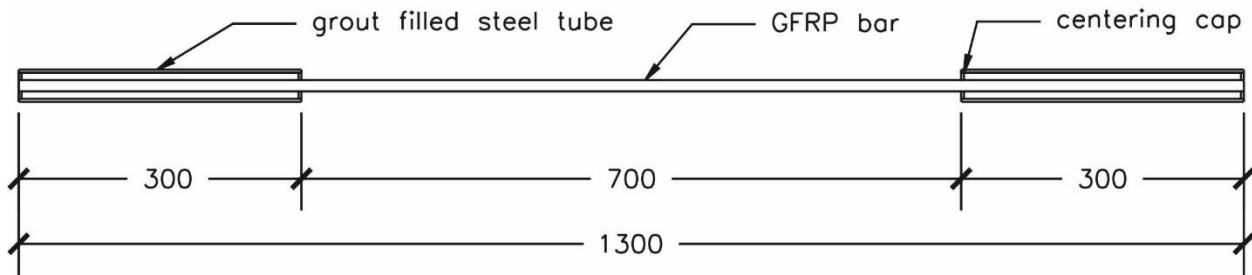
Drawing of 12 mm tensile testing specimen. All other specimens dimensions vary as per Table 3-3.
